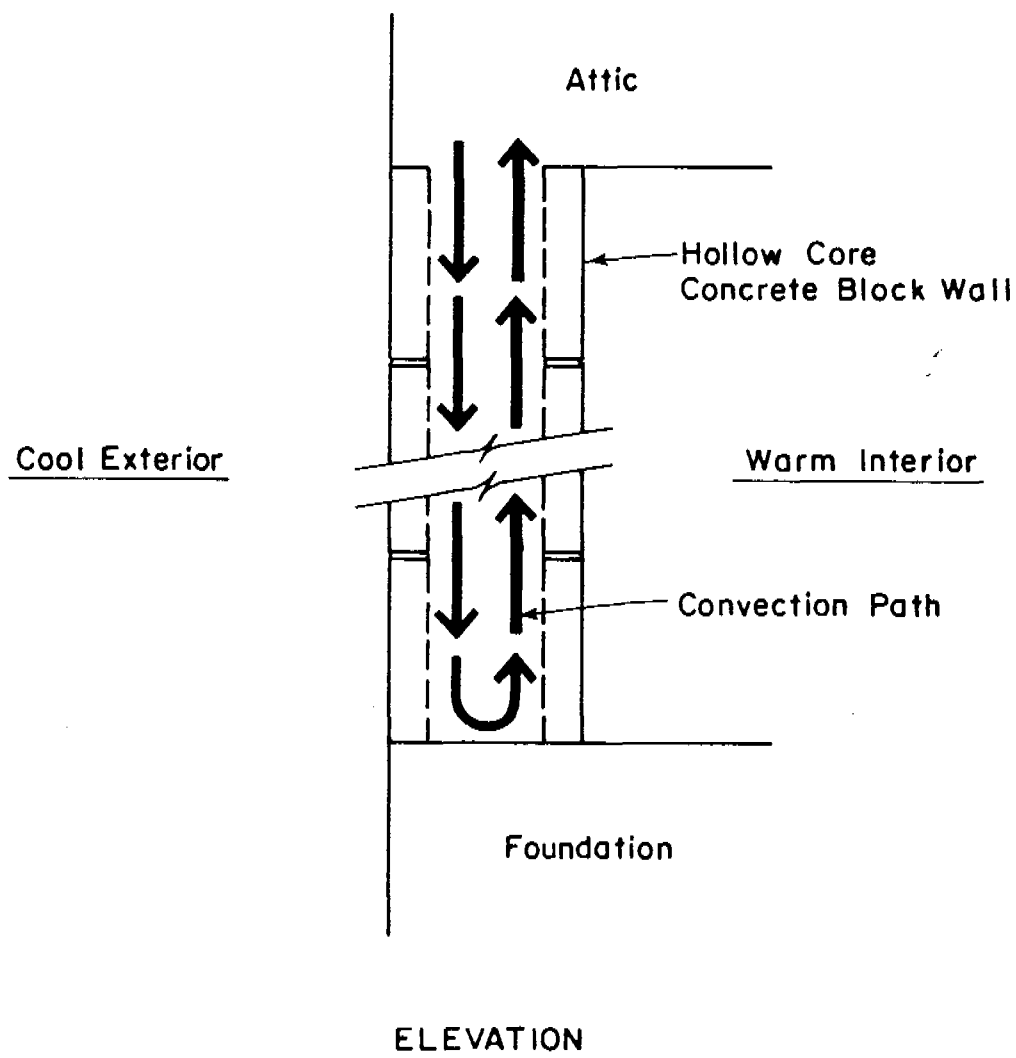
Thermal Bypass Through Hollow Core Concrete Block Wall (Adapted from Ref. 5)
